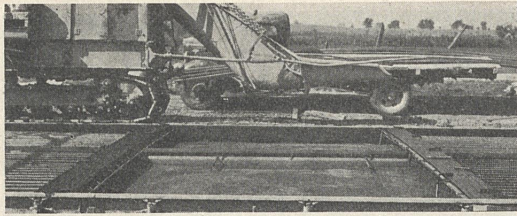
TYPE II JOINT IN PLACE ON THE SUBGRADE PREPARATORY TO PLACING CONCRETE.
